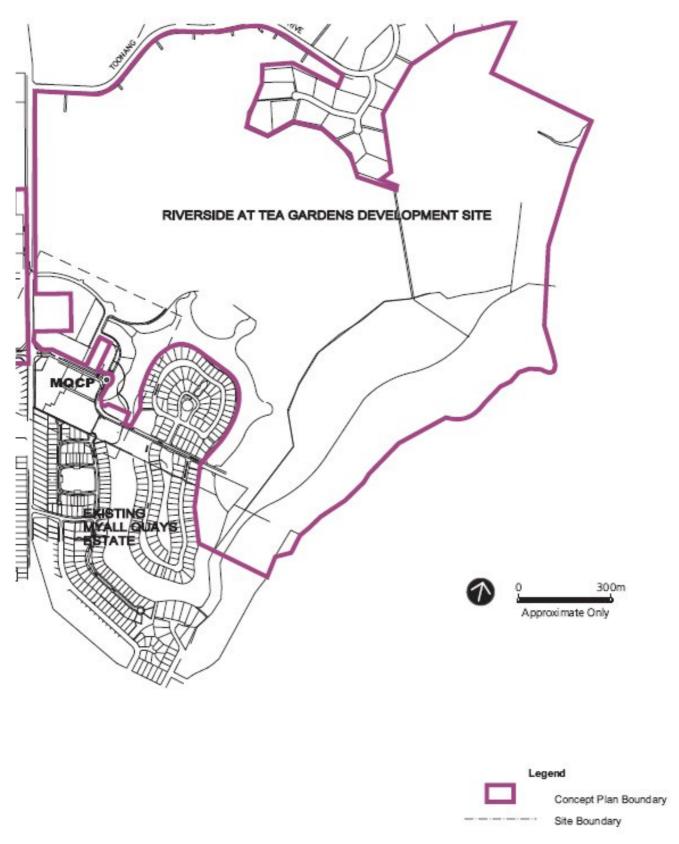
Riverside at Tea Gardens Site Plan (after ERM, 2006)
